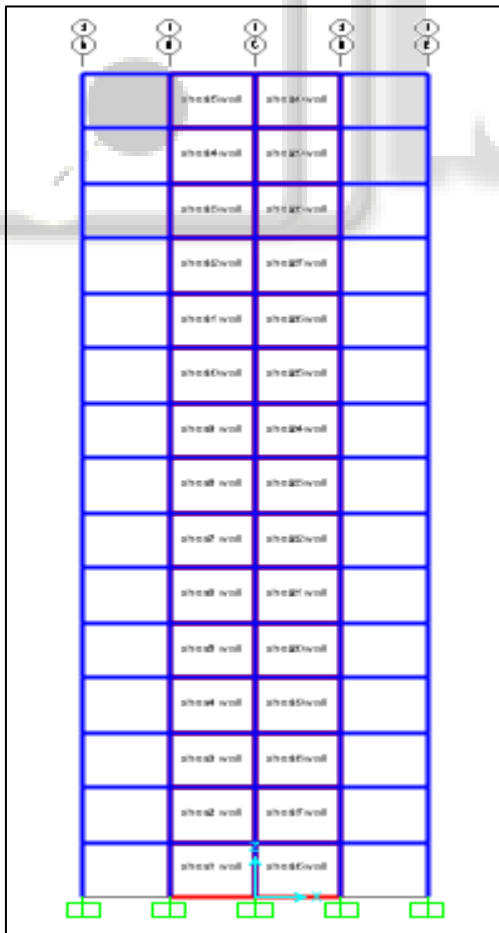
elevation plane of 2d 15 storey building structure with shear wall
